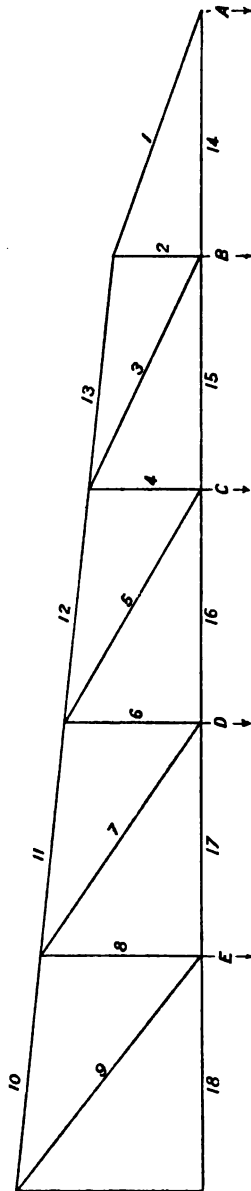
Side Elevation of Cantilever with Linville Bracing.
